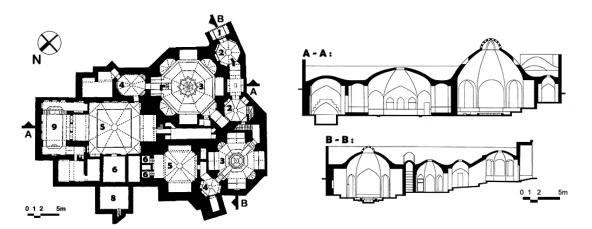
Plan and section of Golshanhammam, Yazd [12]
